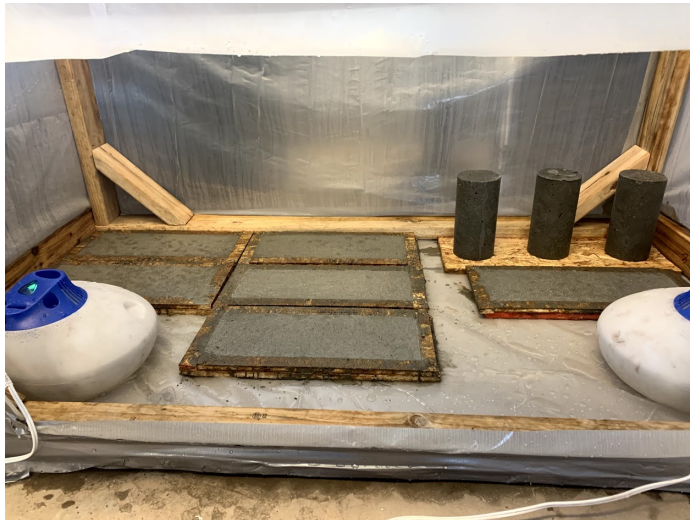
Ponderosa Concrete Canoe Team, 2020-2021, Mini Beams Curing in Curing Chamber[5]
